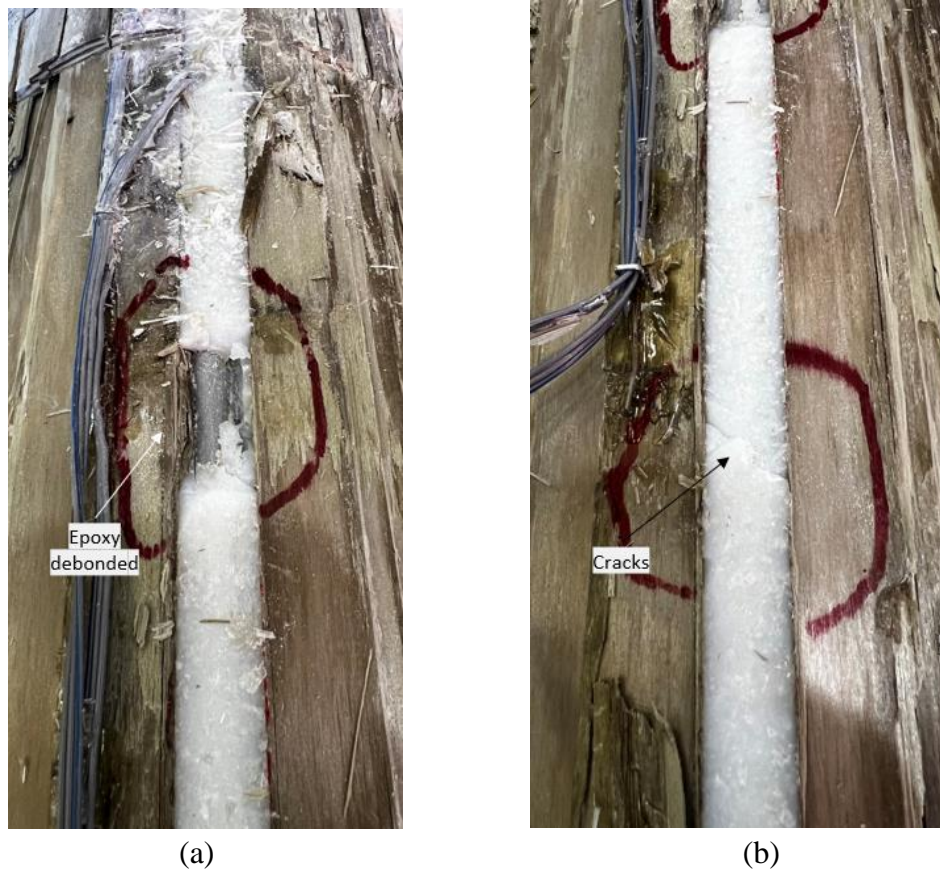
Epoxy conditions after the test for specimen N-3WC-6-TB, (a) De-bonded epoxy, and (b) Epoxy cracks
